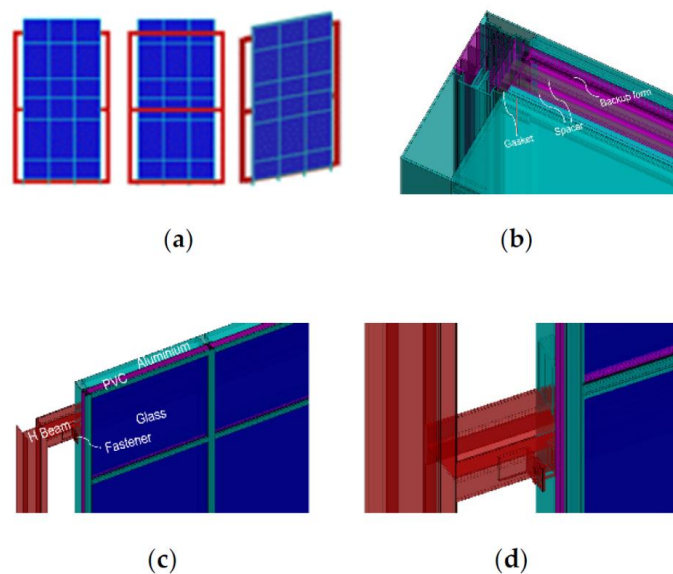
Details of full-frame FE model in solid form: (a) external shape of the FE model; (b) internal member detail; (c) chamber and aluminum frame; (d) anchor connection (images and caption are from Lee et al., 2021)
